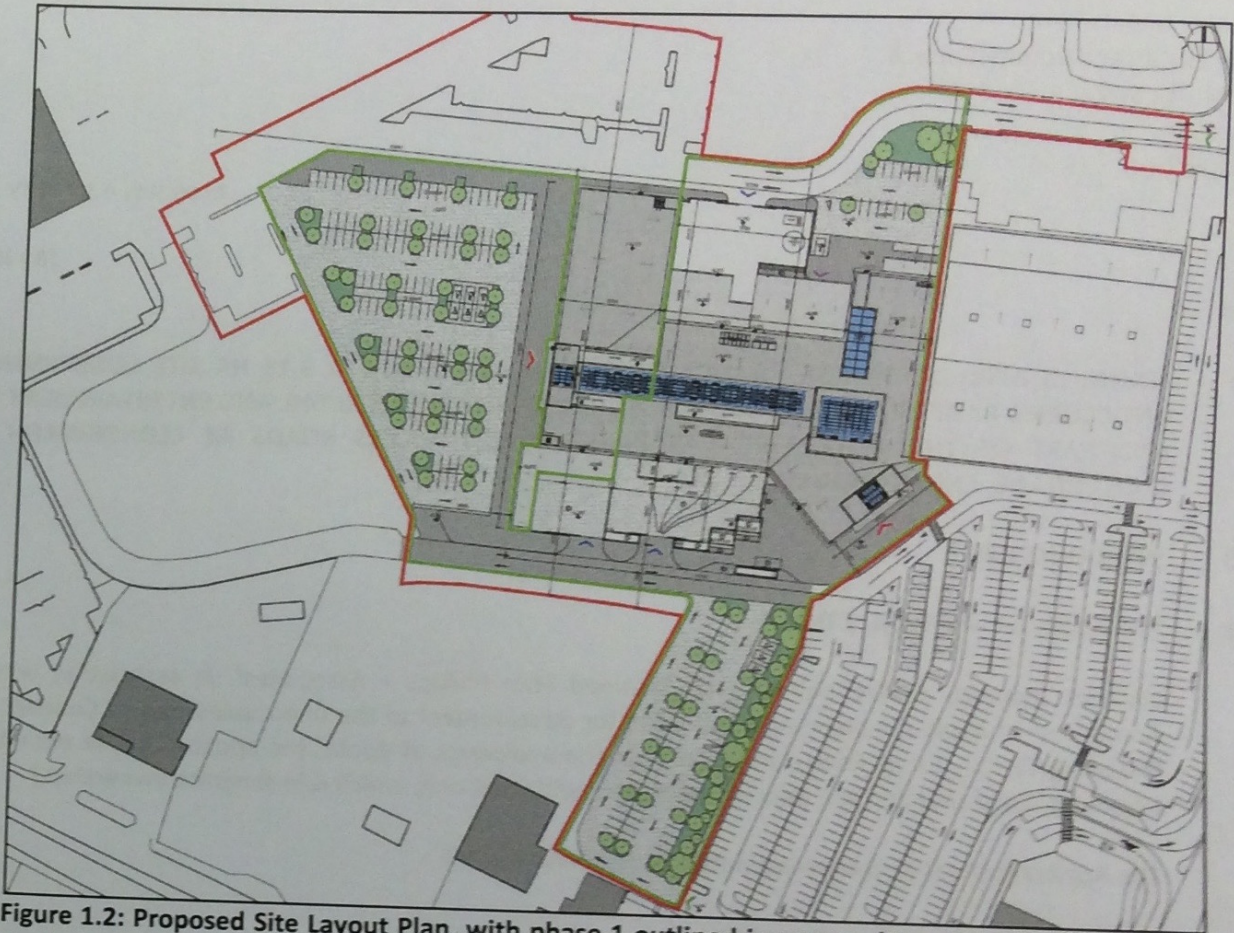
Proposed Site Layout Plan, with phase 1 outlined in green. (Source: BDP Architects, Dwg No. (20)AP001.)
